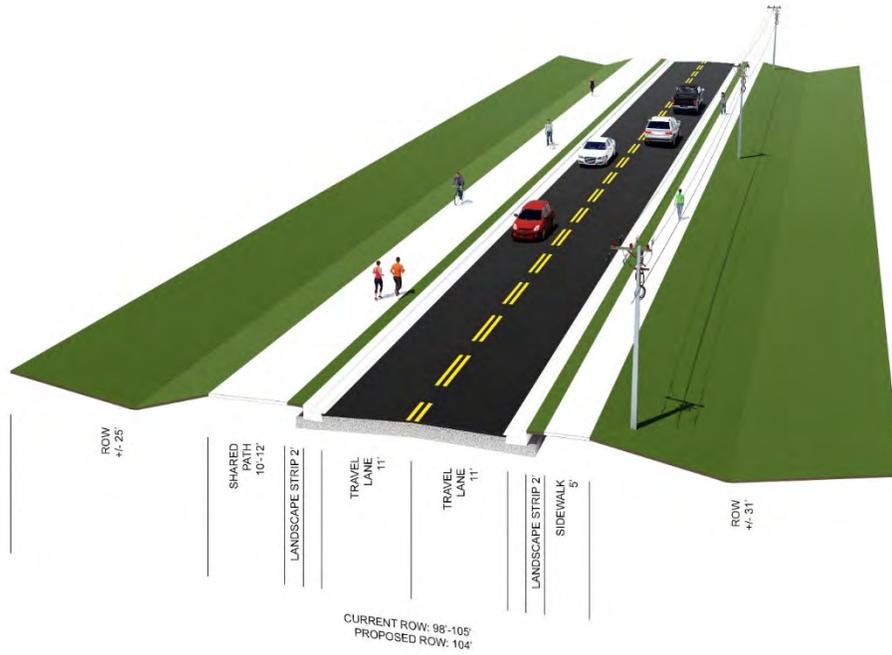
North Lake Bradford Road from Springhill Road to Gaines Street Typical Section
